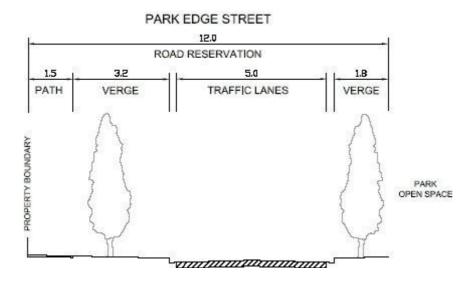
(d) Port Sorell and Environs Street Cross-section designs - Park Edge Street
